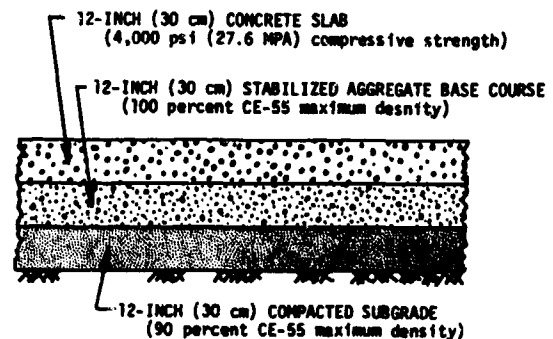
Typical DISTANT RUNNER shelter slab cross-section.
